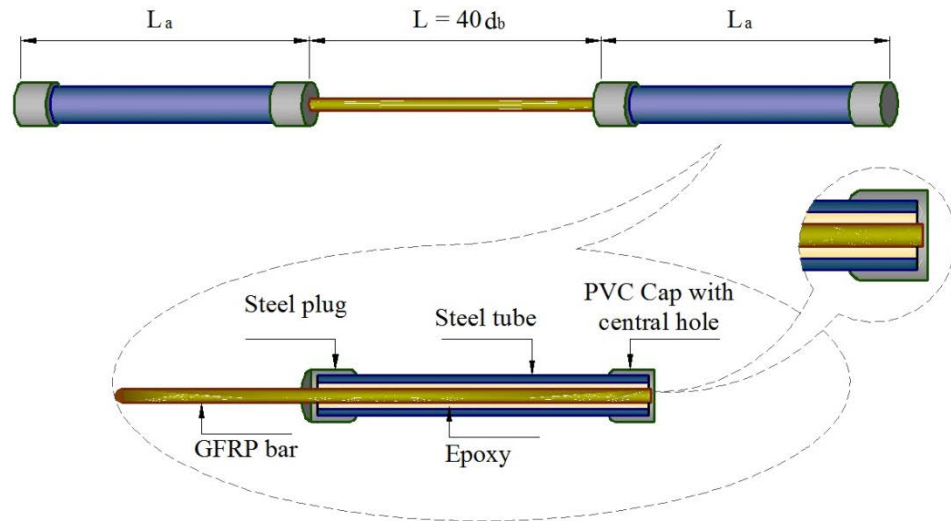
Typical GFRP bar tensile test specimen with end anchors
